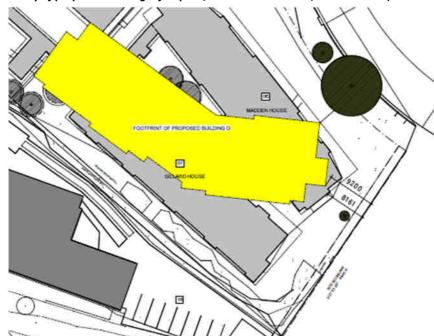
Overlay of proposed Building D footprint/setbacks on Madden/Gillard House (Architect provided).
